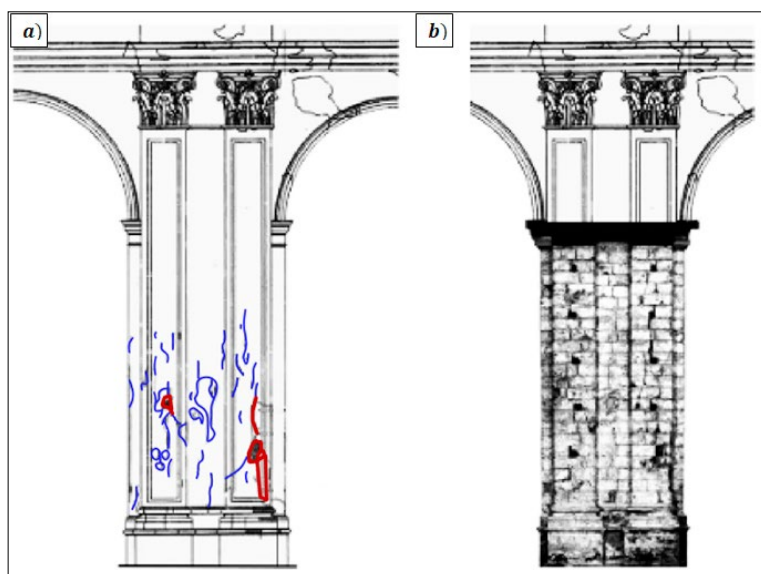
Damage to the pillars in Noto Cathedral: a) image of the damage (blue—scratches, red - cracks), b) view of the damage; source: L. Binda et al., *Non destructive testing techniques applied to masonry and timber structures of the Crocifisso Church in Noto*, [in:] *Retrofitting of Heritage Structures: Design and Evaluation of Strengthening Techniques*, ed. S. Syngellakis, Ashurst 2013, p. 75–87.
